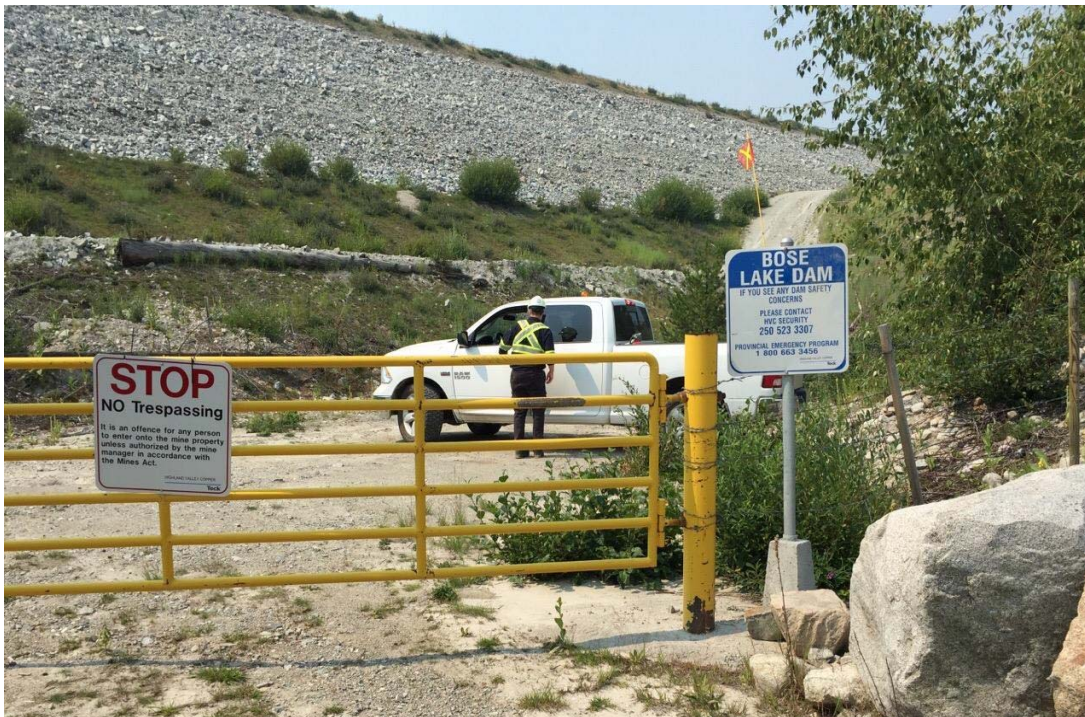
Downstream slope at mid-point of dam, looking east at Bose Lake (BTH-2018-09)
